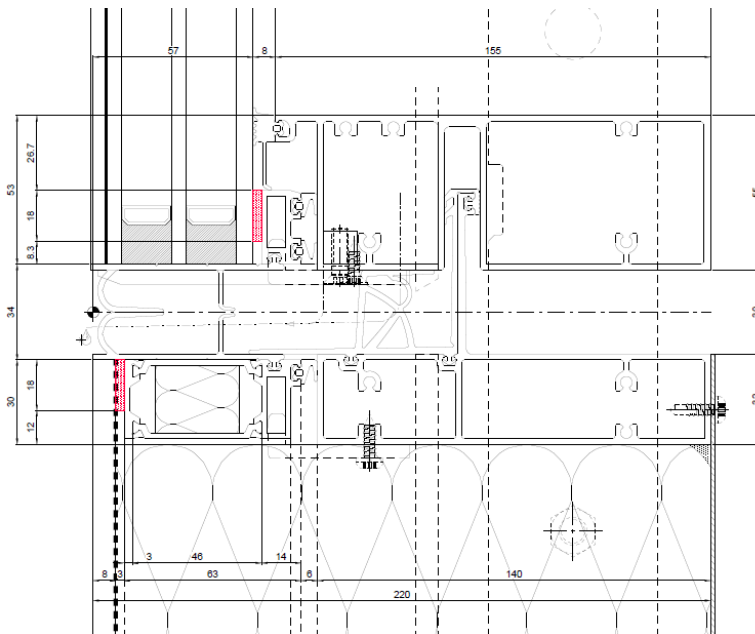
Example of potential vertical section element joint for a unitized curtain wall, using DOWSIL™ TSSS for the bonding of the insulating glass and spandrel (KGC).
